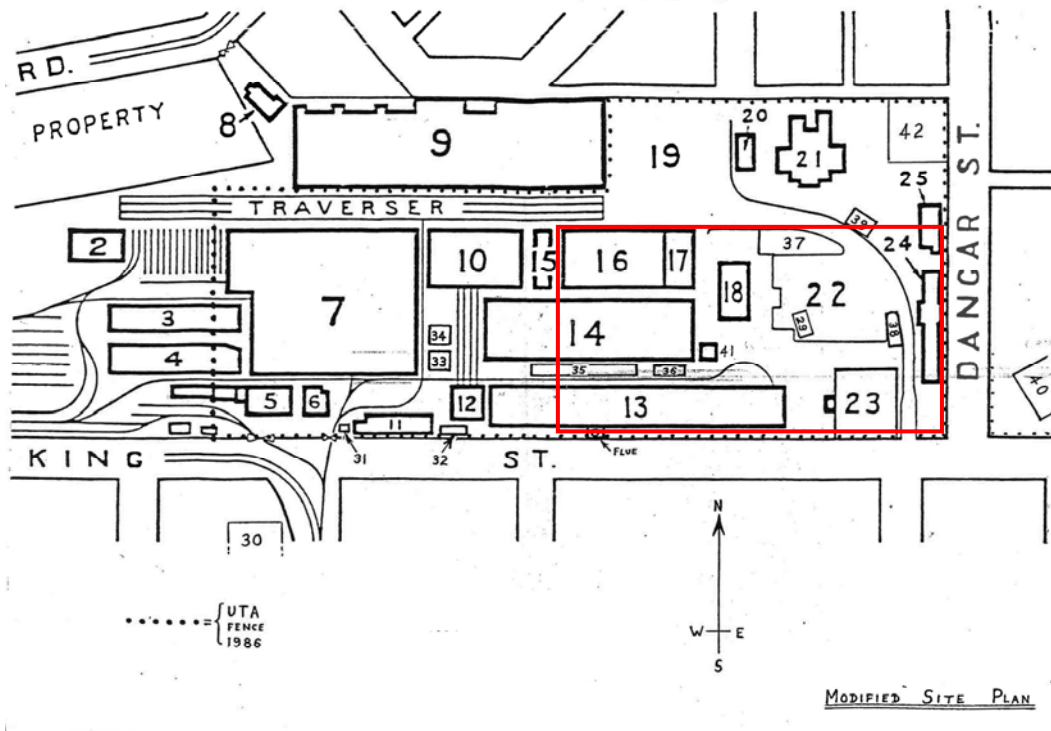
Site Plan circa 1896, showing a record of the former Randwick Bus Depot buildings. The subject area for the new development is outlined in red. The remainder of the site has been redeveloped as part of the Master Plan in c.2001. Building 13 is identified as the Blacksmith, Boiler and Welding Shop.
